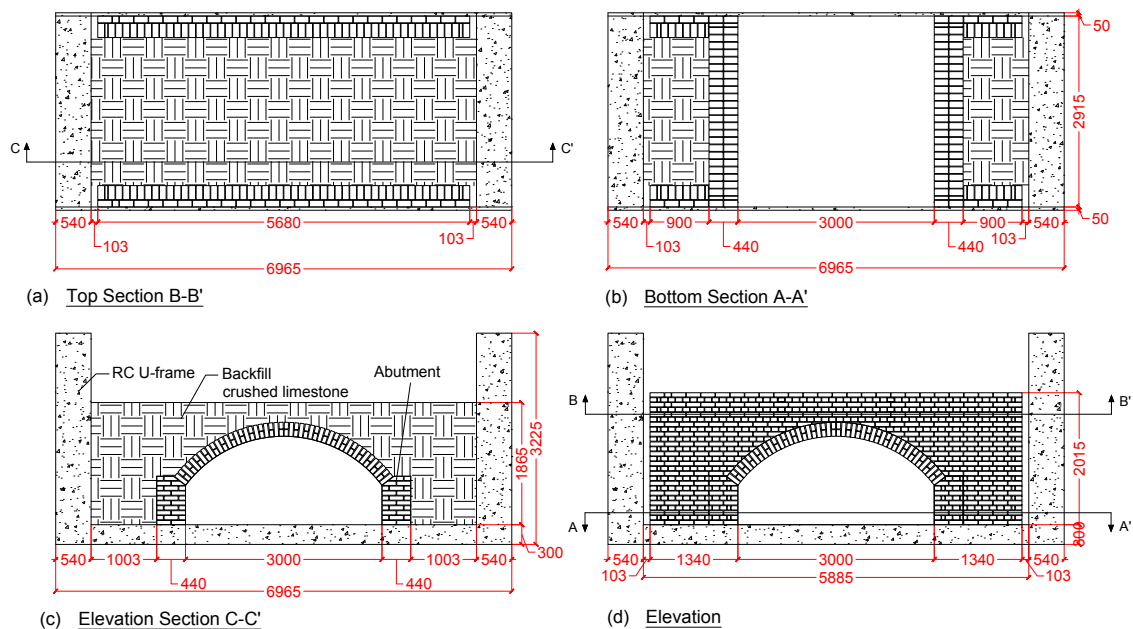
Details of the large-scale masonry arch bridge: (a) top view; (b) bottom section A-A'; (c) elevation section C-C'; and (d) elevation (side view) (all dimensions in mm).
